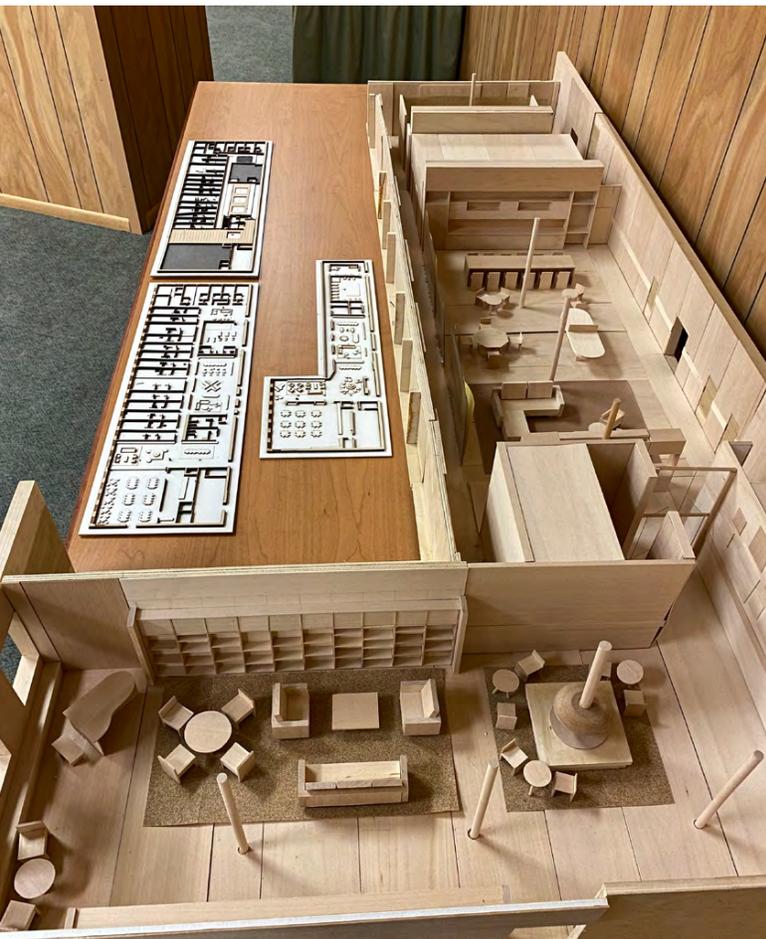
Raised line floor plans (white) and tactile 3-D model of rooms
